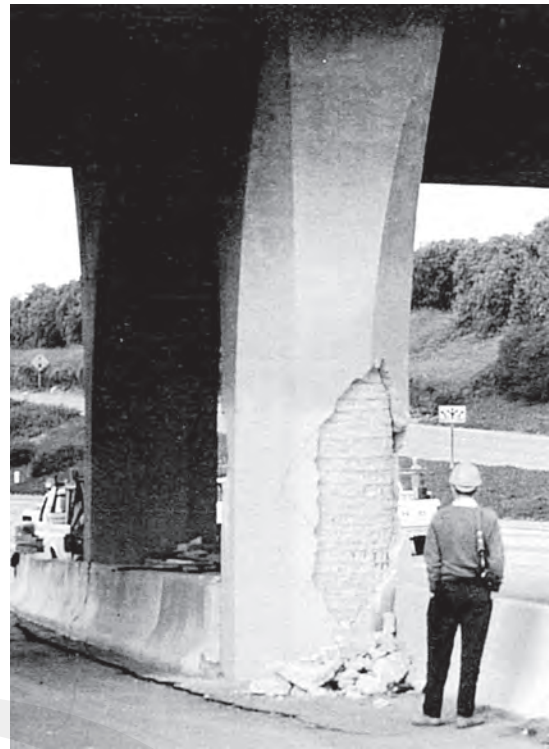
Acceptable damage (spalling of cover concrete) to a bridge column for large earthquake.
